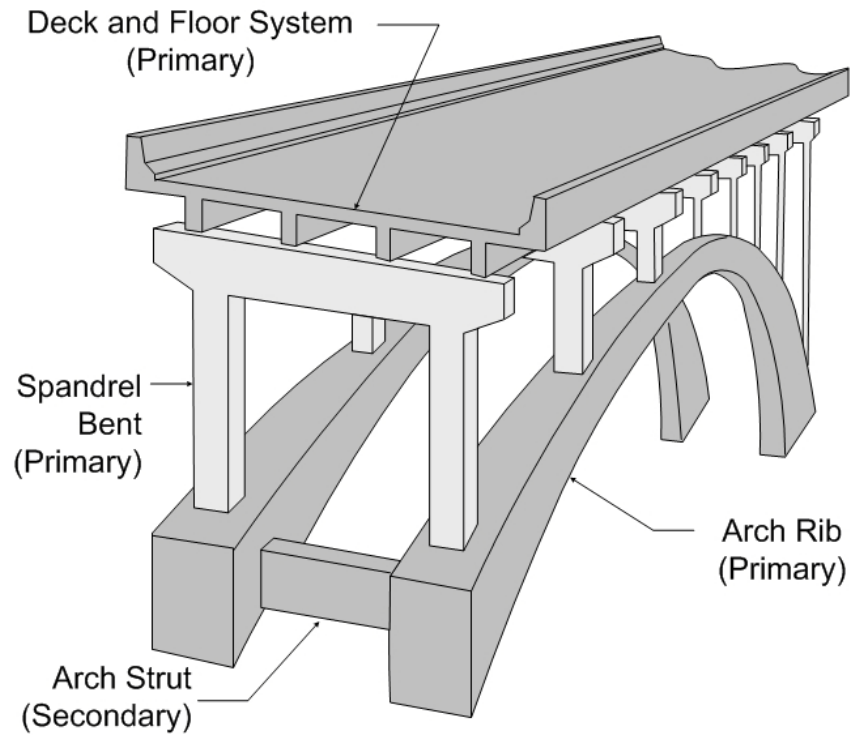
Primary and Secondary Members of an Open Spandrel Arch
